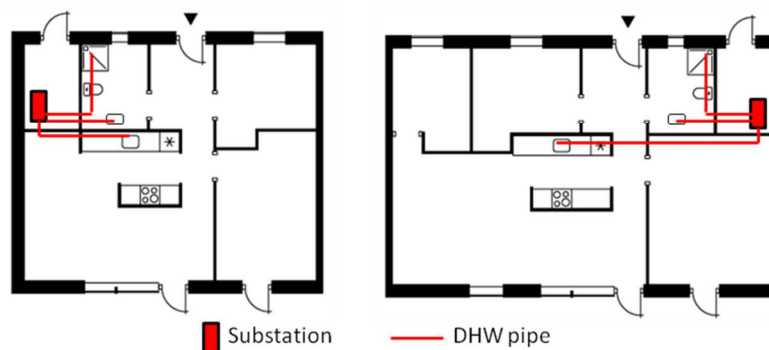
Sketch of the floor plans with the layout of the DHW distribution pipelines in the two dwellings without DHW circulation.
